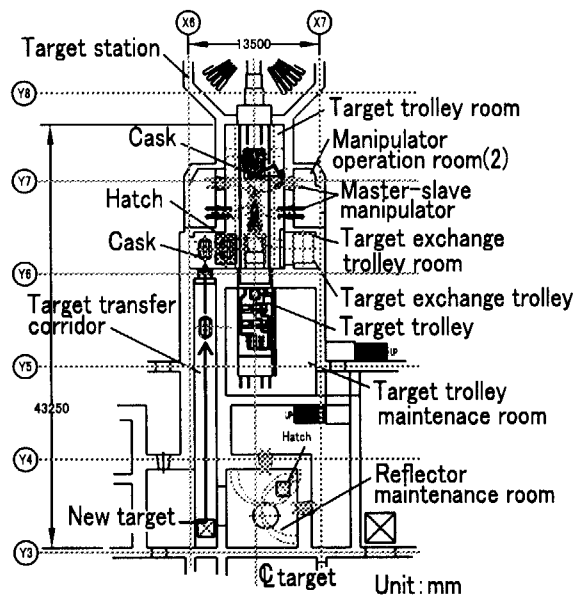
Arrangement of handling system for spent target vessel(First floor)
